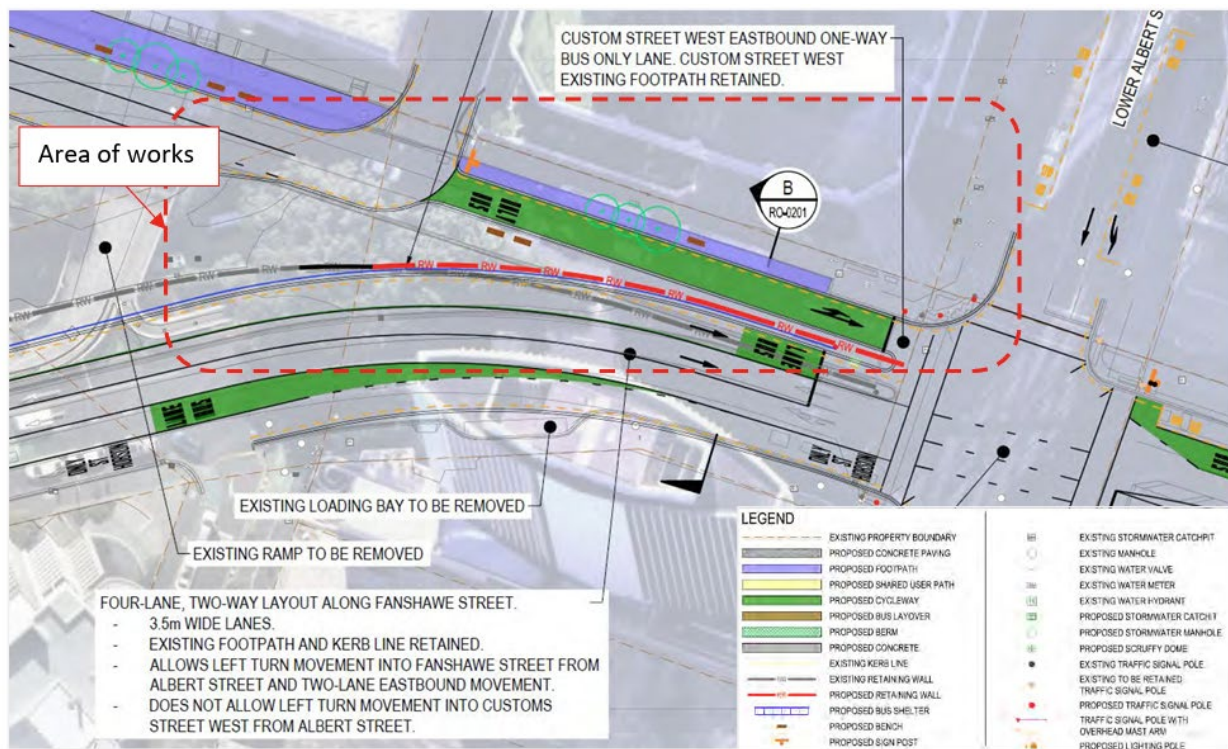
Retaining Wall Realignment General Arrangement Plan
